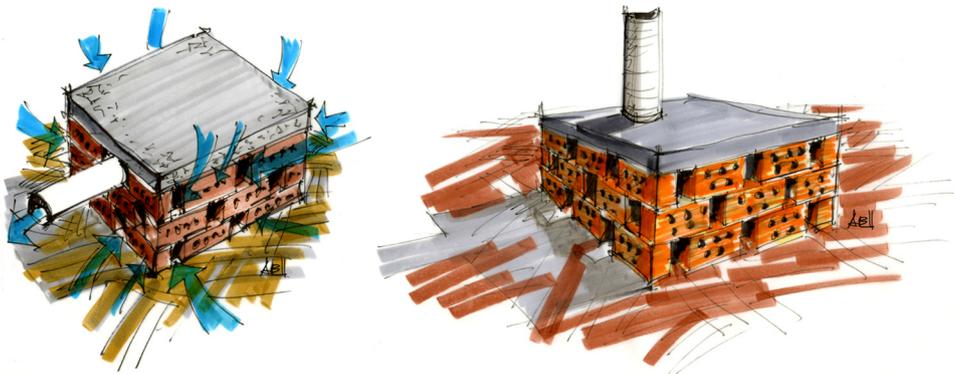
Built on site sump [15] (courtesy of architect António Batista Coelho).
